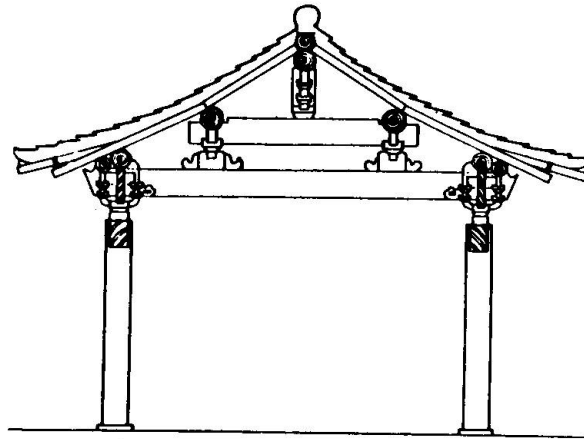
Framing of traditional timber roofs in China and in Japan.
